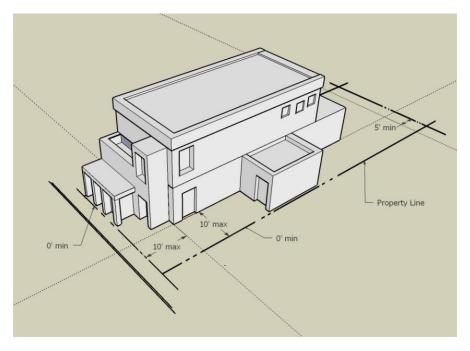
NFMXDD BUILDING PLACEMENT
